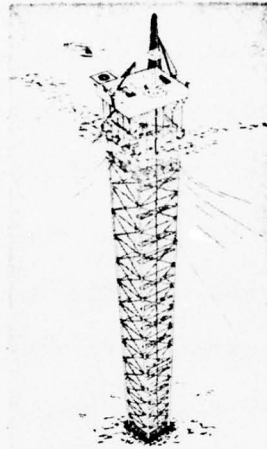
Exxon's Guyed, Compliant Steel Tower
